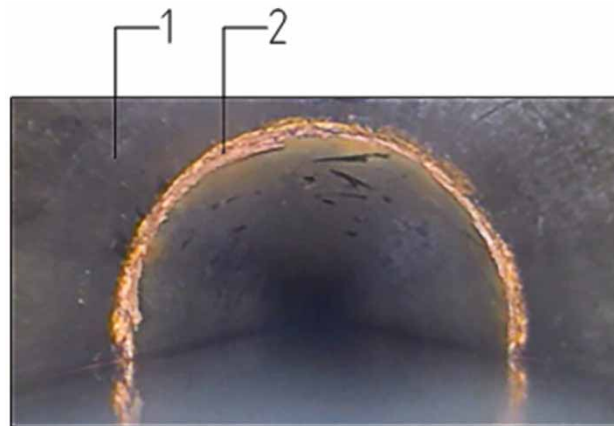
| Facade photo of pipe scale at the joint of cast iron pipes for water supply pipeline. (1) Inner wall of socket and spigot connected cast iron pipes with anti-corrosion lining; (2) facade photo of pipe scale at socket and spigot connected cast iron pipes connection.
